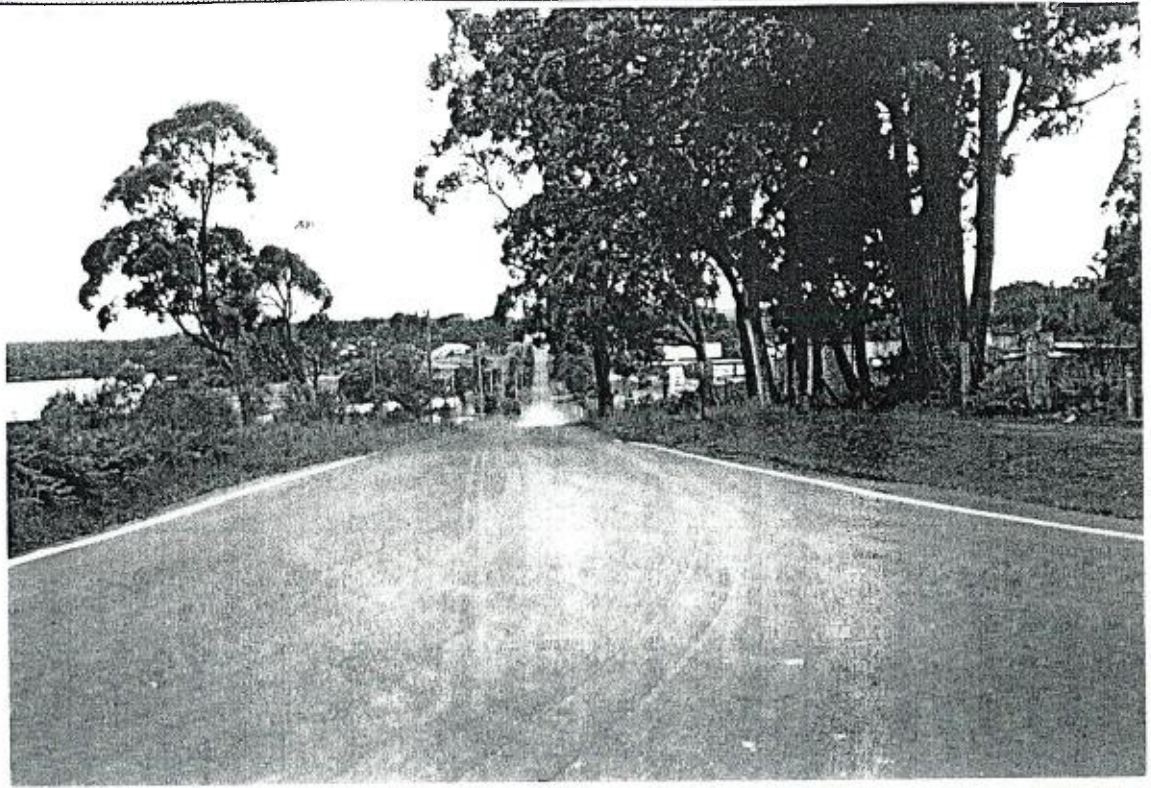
View east along Roberts Road from Old Northern Road.
